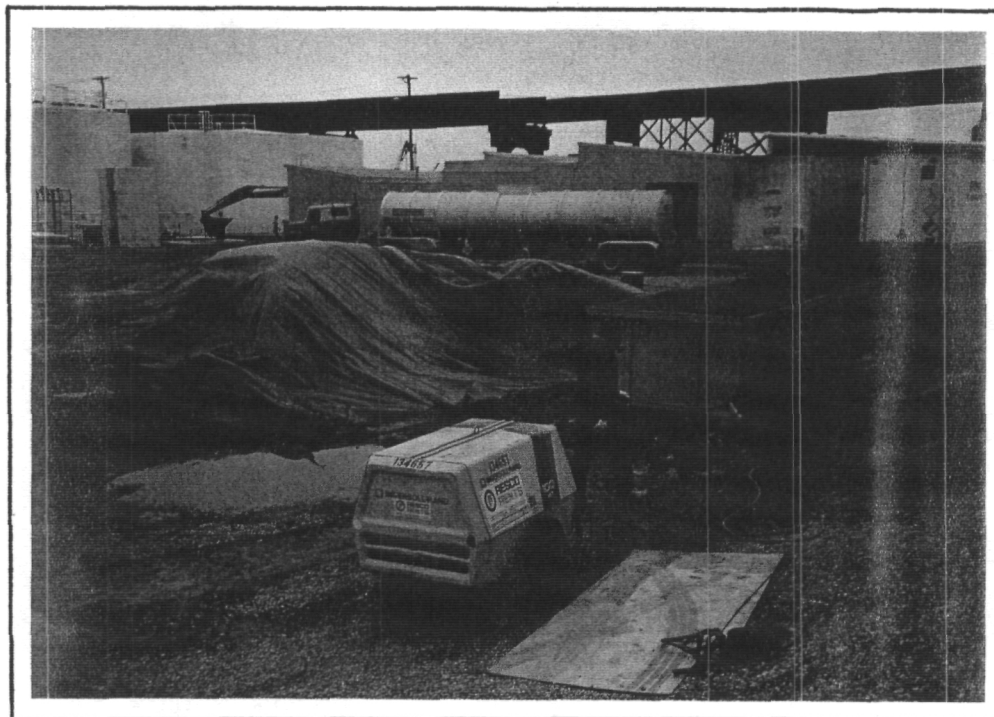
Plastic sheeting was used to keep the pile dry and to prevent contaminated runoff from entering the excavation.
